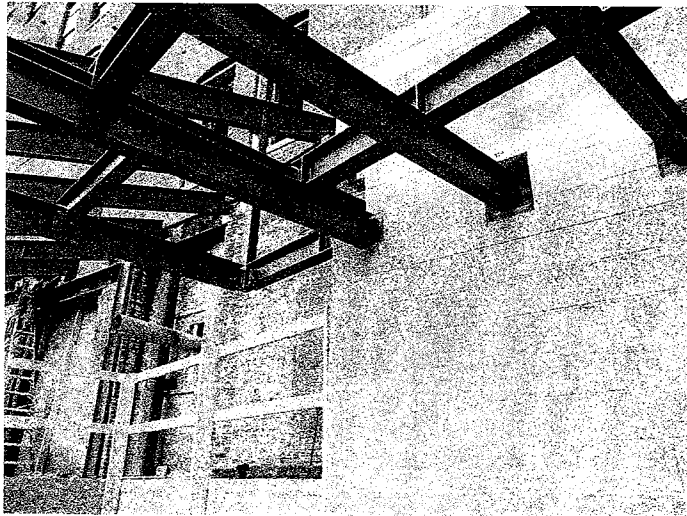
Structural Steel at Back Entrance (installation in progress)
